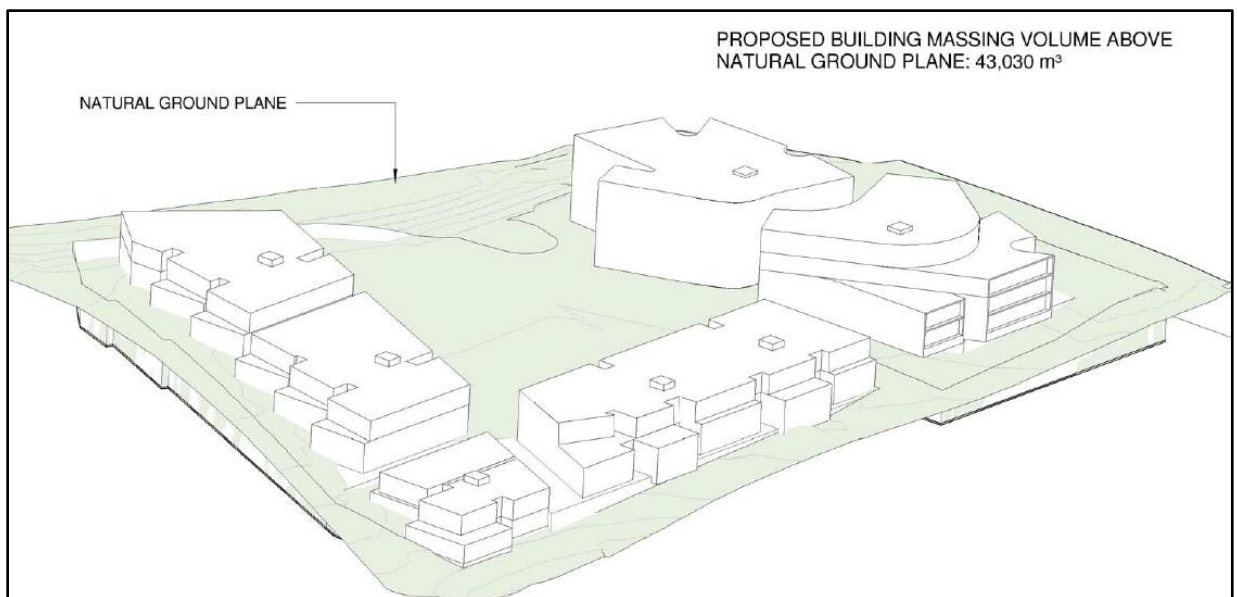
PROPOSED MODIFICATION – BUILDING MASSING ABOVE NATURAL GROUND PLANE
